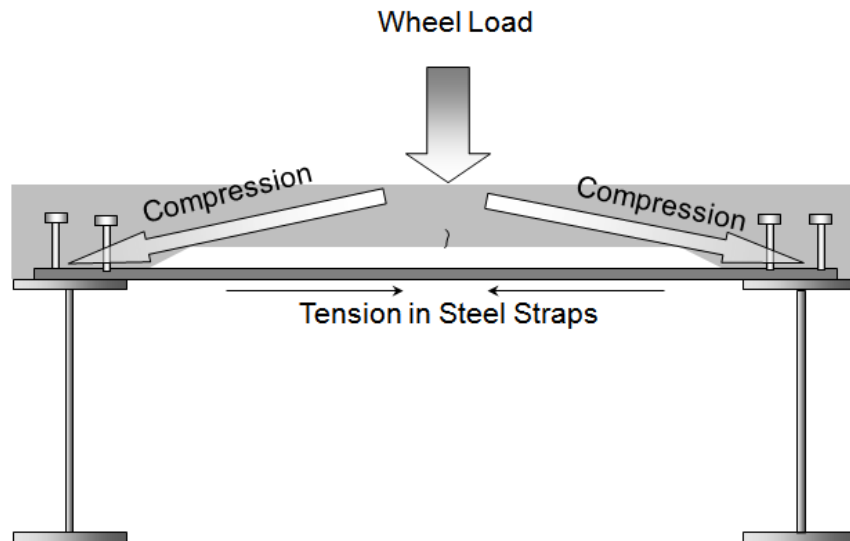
Steel-free bridge deck slab confined using steel straps
